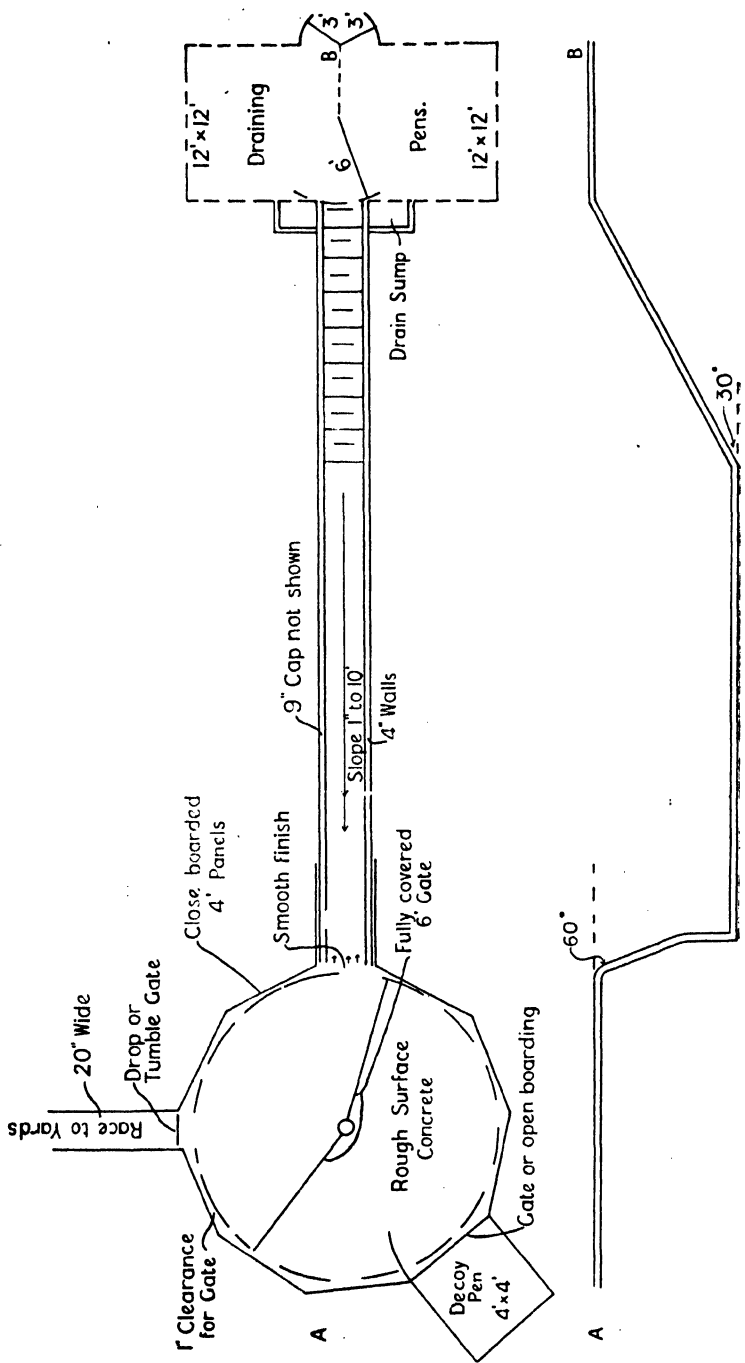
Sketch showing layout of dip with circular catching pen.
